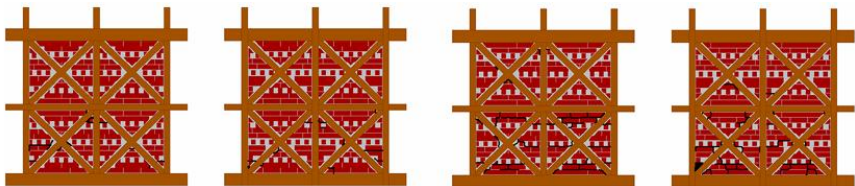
Dhaj-i-Dewari wall showing its cracking patterns [9]
